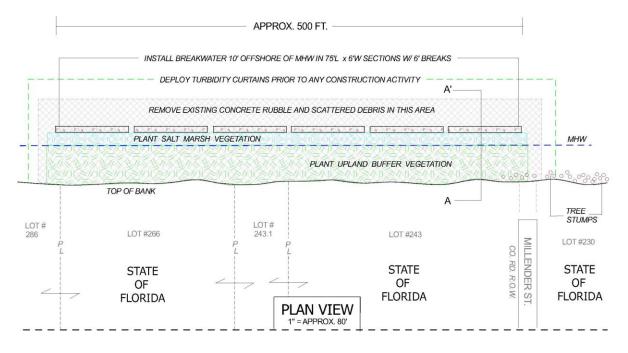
APALACHICOLA BAY BREAKWATER CONSTRUCTION PROJECT
